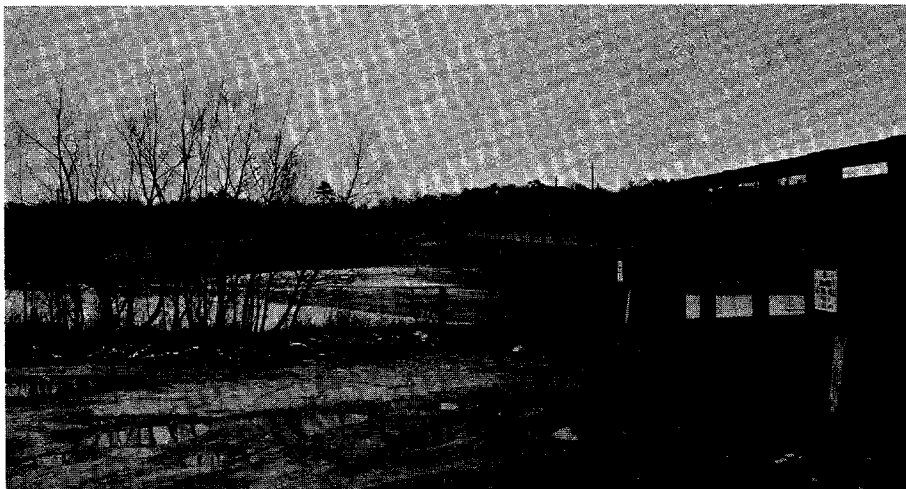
View of upstream side of US-61 bridge, looking toward left bank, on February 15, 1977. Revetted embankment of entering SR-964 is visible beyond bank.
